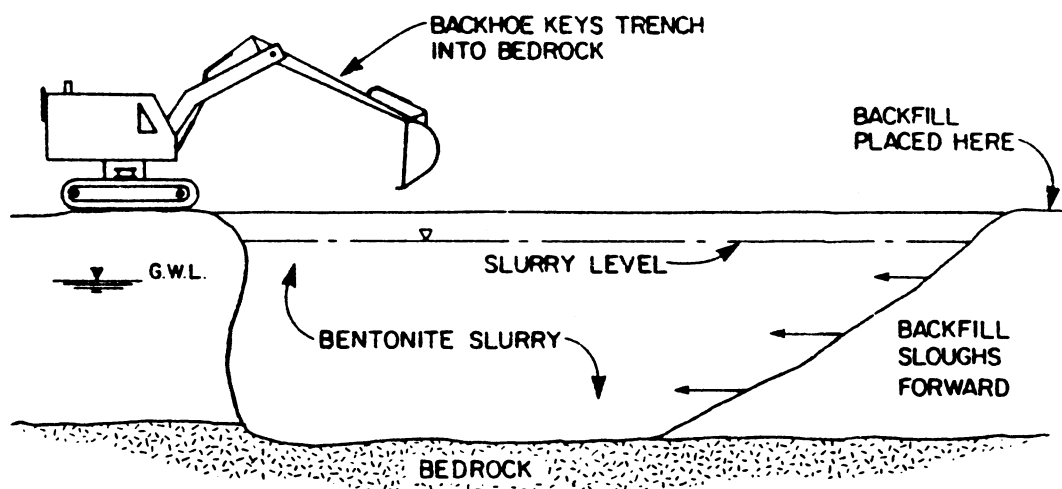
Schematic Section of Slurry Wall Construction (Source: Ayres et al. 1983)
